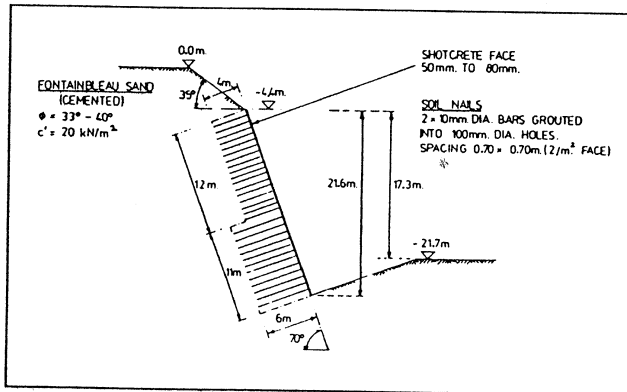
Cross-section of the highest cut at the Versailles-Chantier excavation (After Toudic, 1975)
